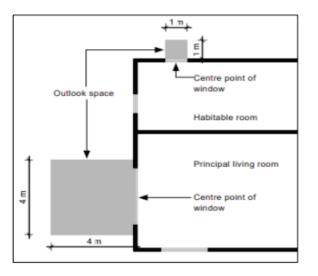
outlook space requirements for development containing up to three dwellings (H5.6.12.A1)
